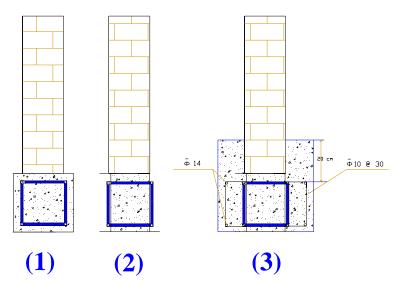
Addition of ties beneath the walls by passing the steel bars trough the wall and adding some more concrete around it
